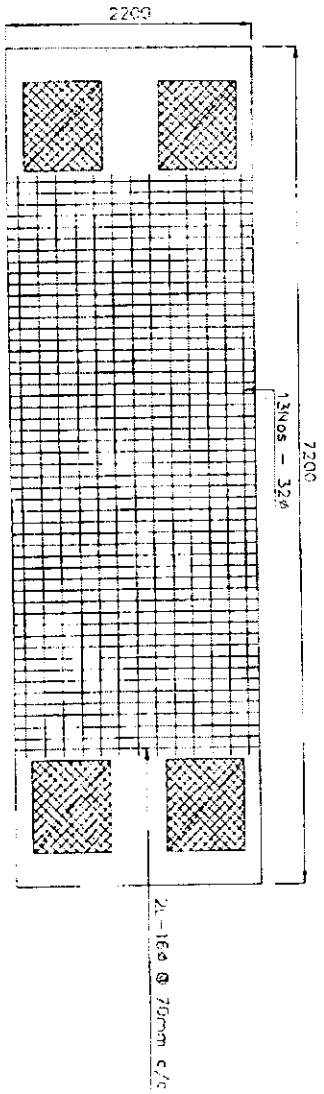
ADDITIONAL STEEL REINFORCEMENTS AT THE TOP OF PIER CAP
